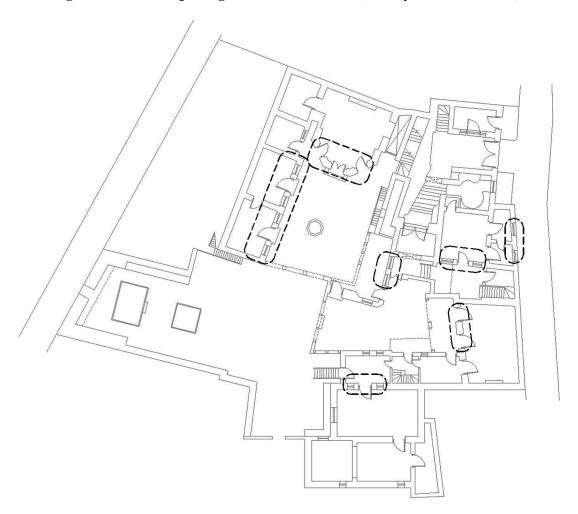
Ground Floor Plan Showing Two or More Openings in the Same Wall
